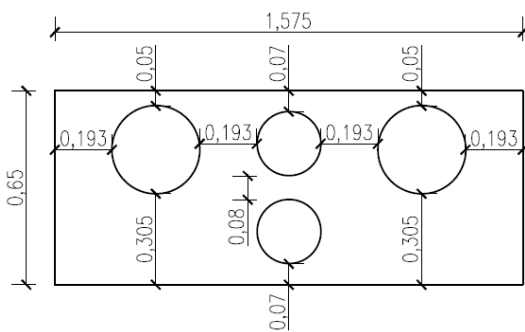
Arrangement of the anchors of the prestress cables in the central strips
